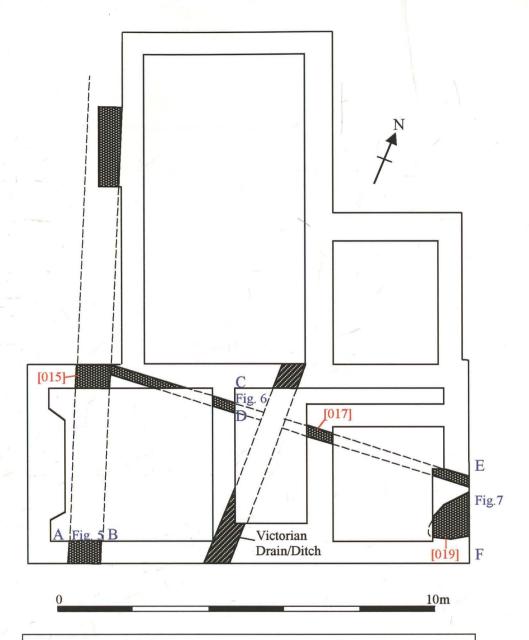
Plan of the foundation trenches for the house, showing the actual and projected location of the archaeological features. Scale 1:100
